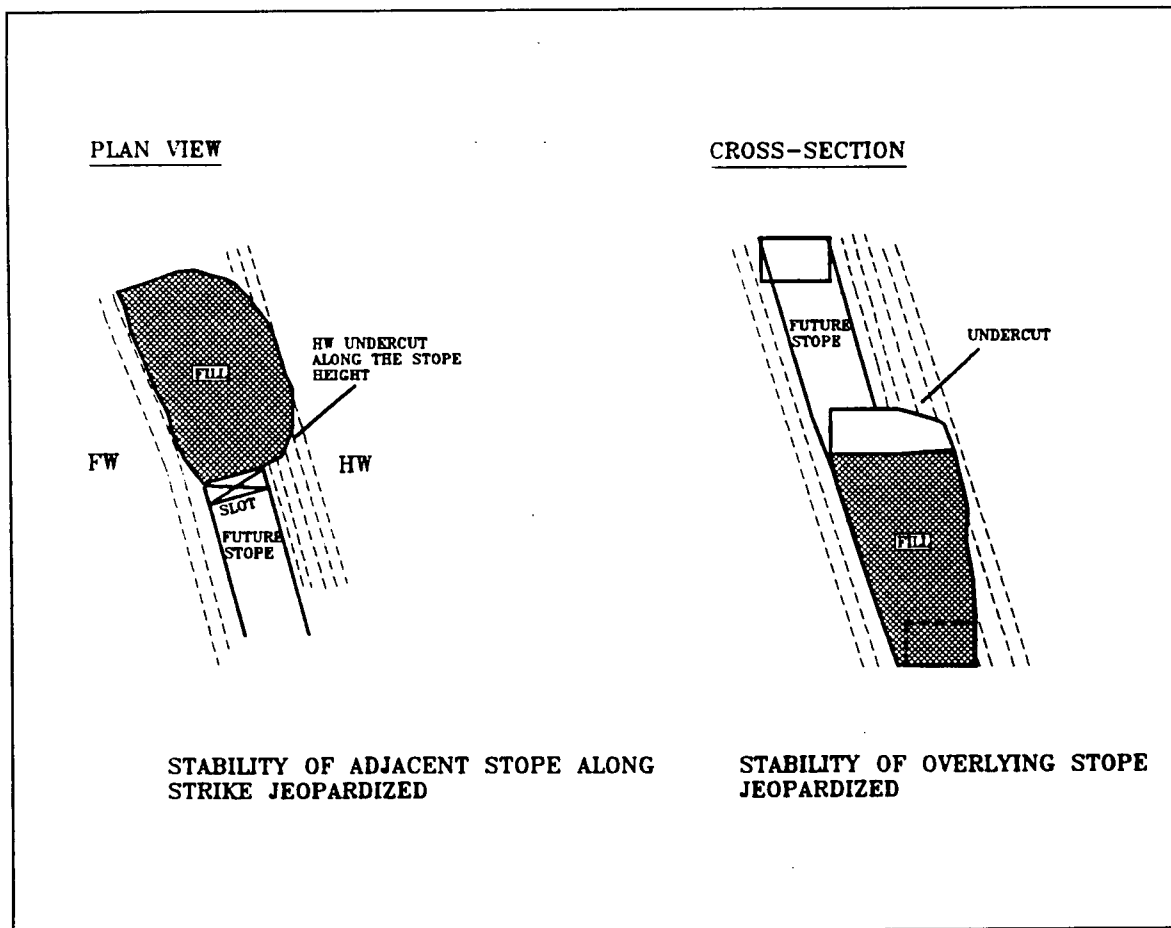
Effect of wall collapse on adjacent stoping panels
